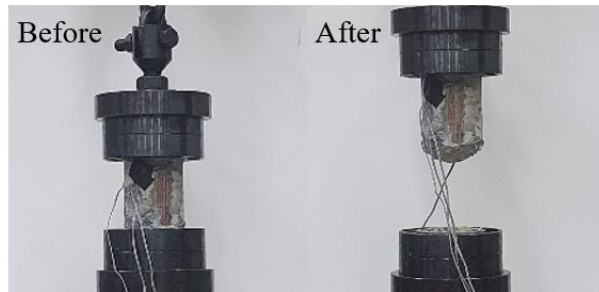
Test specimen of 1st preliminary test (Uniaxial tensile)
